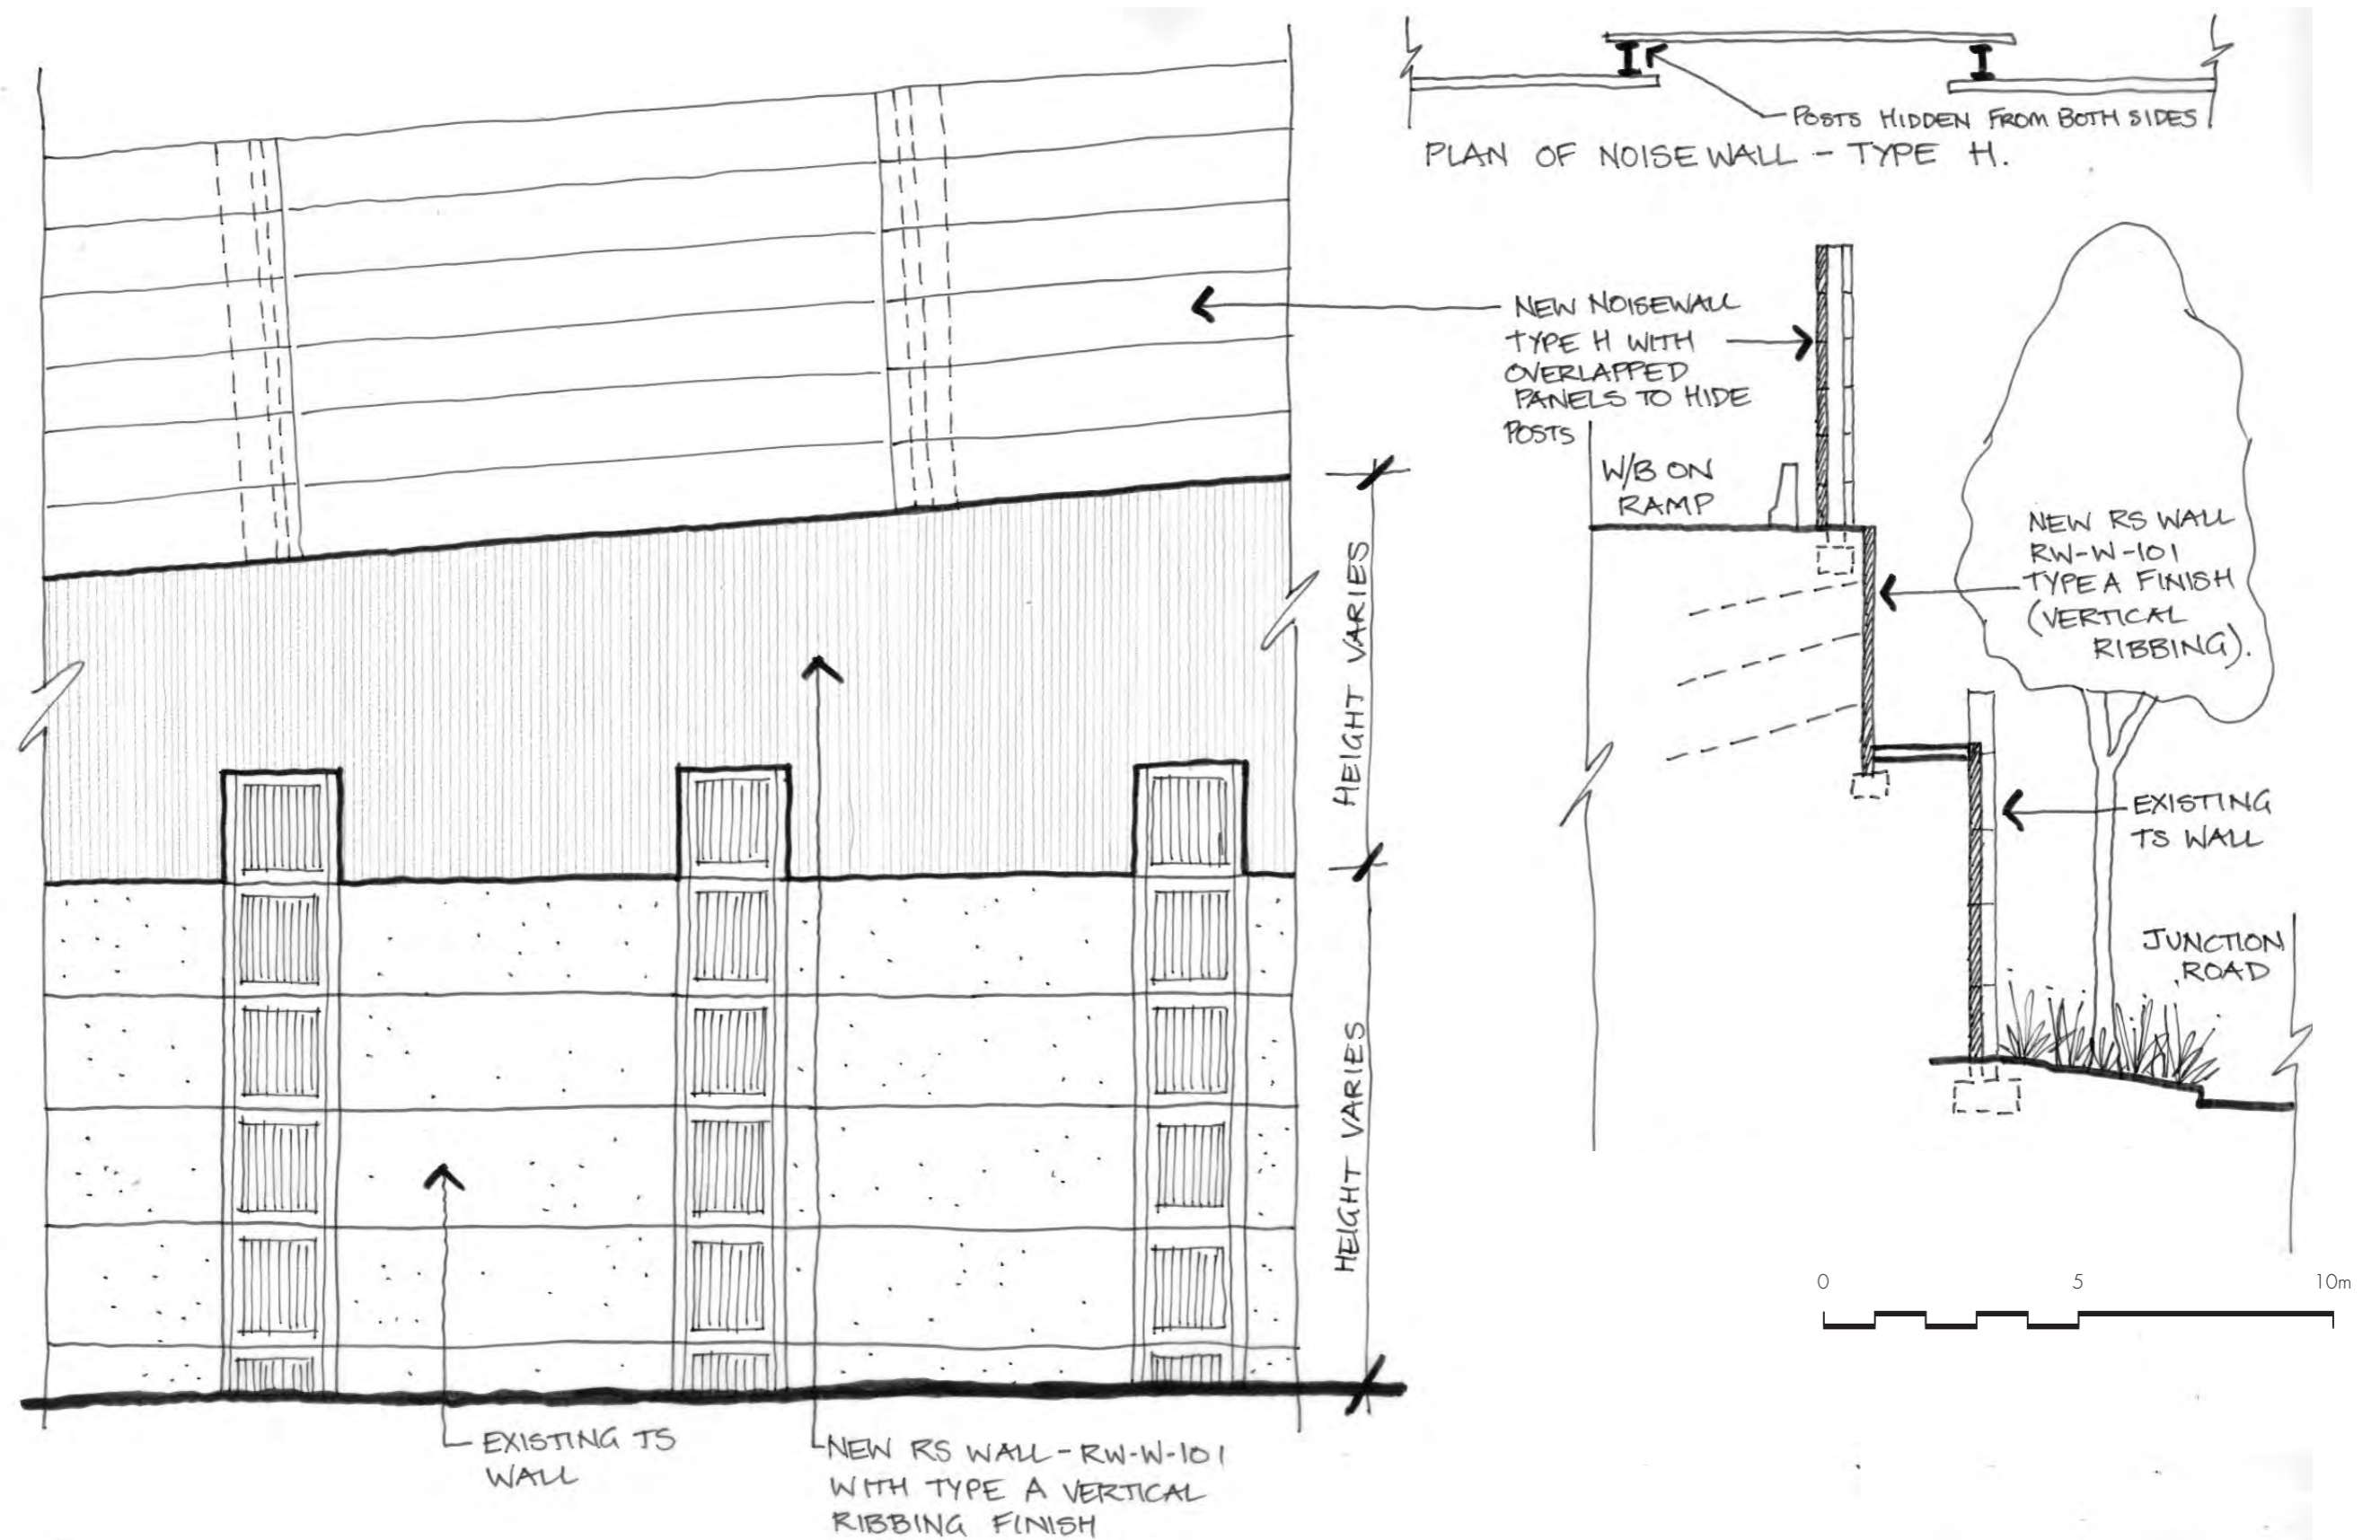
Type A Retaining Wall at Windsor Road Overbridge
